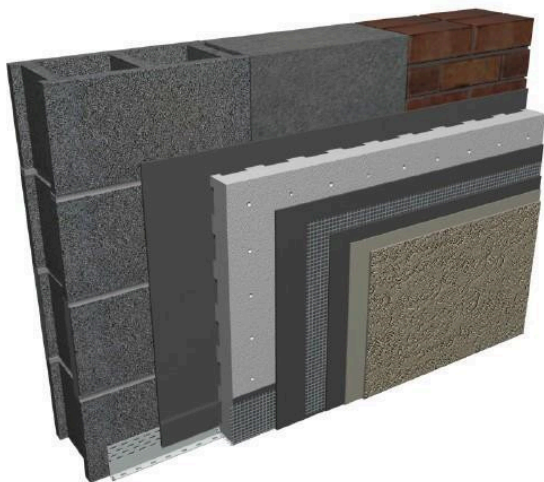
InsulROCK EIFS over modified bituminous membrane on masonry, concrete, and brick
